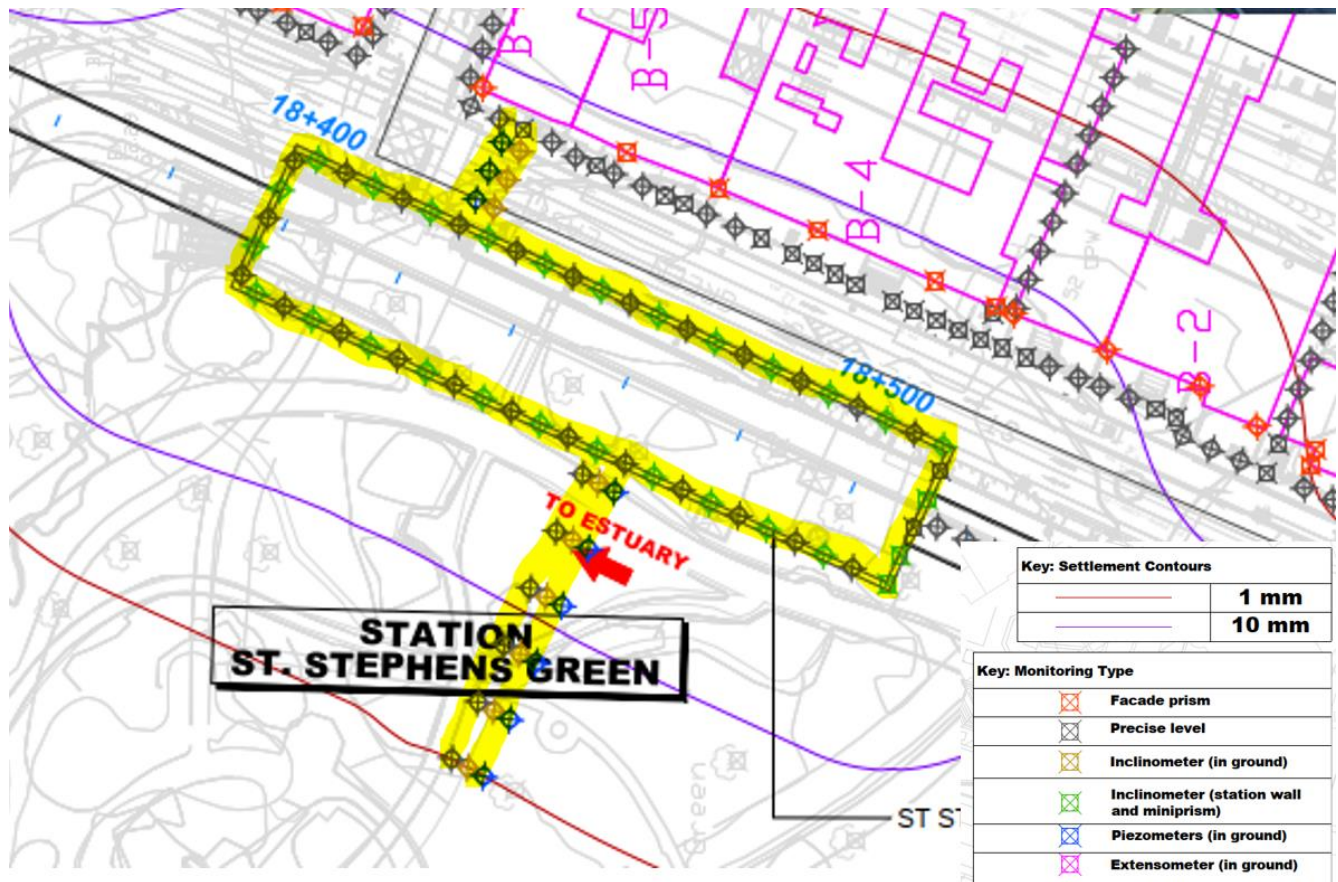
Station Excavation Proposed Construction Monitoring (highlighted)
